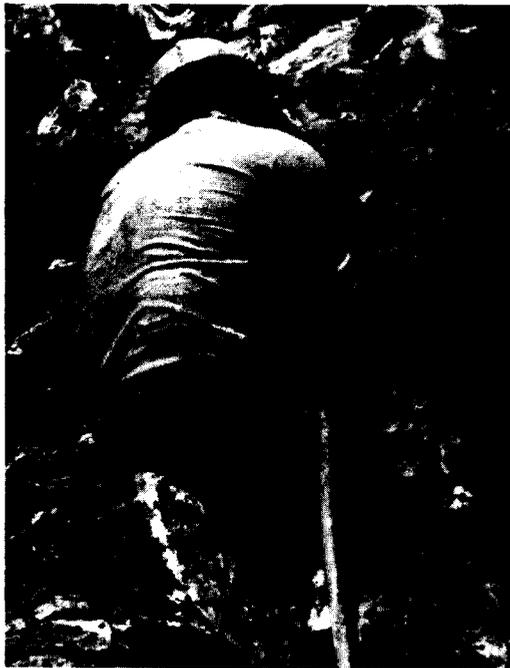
Shear zones were removed with a hand-held air spade. P801-D-81050.
